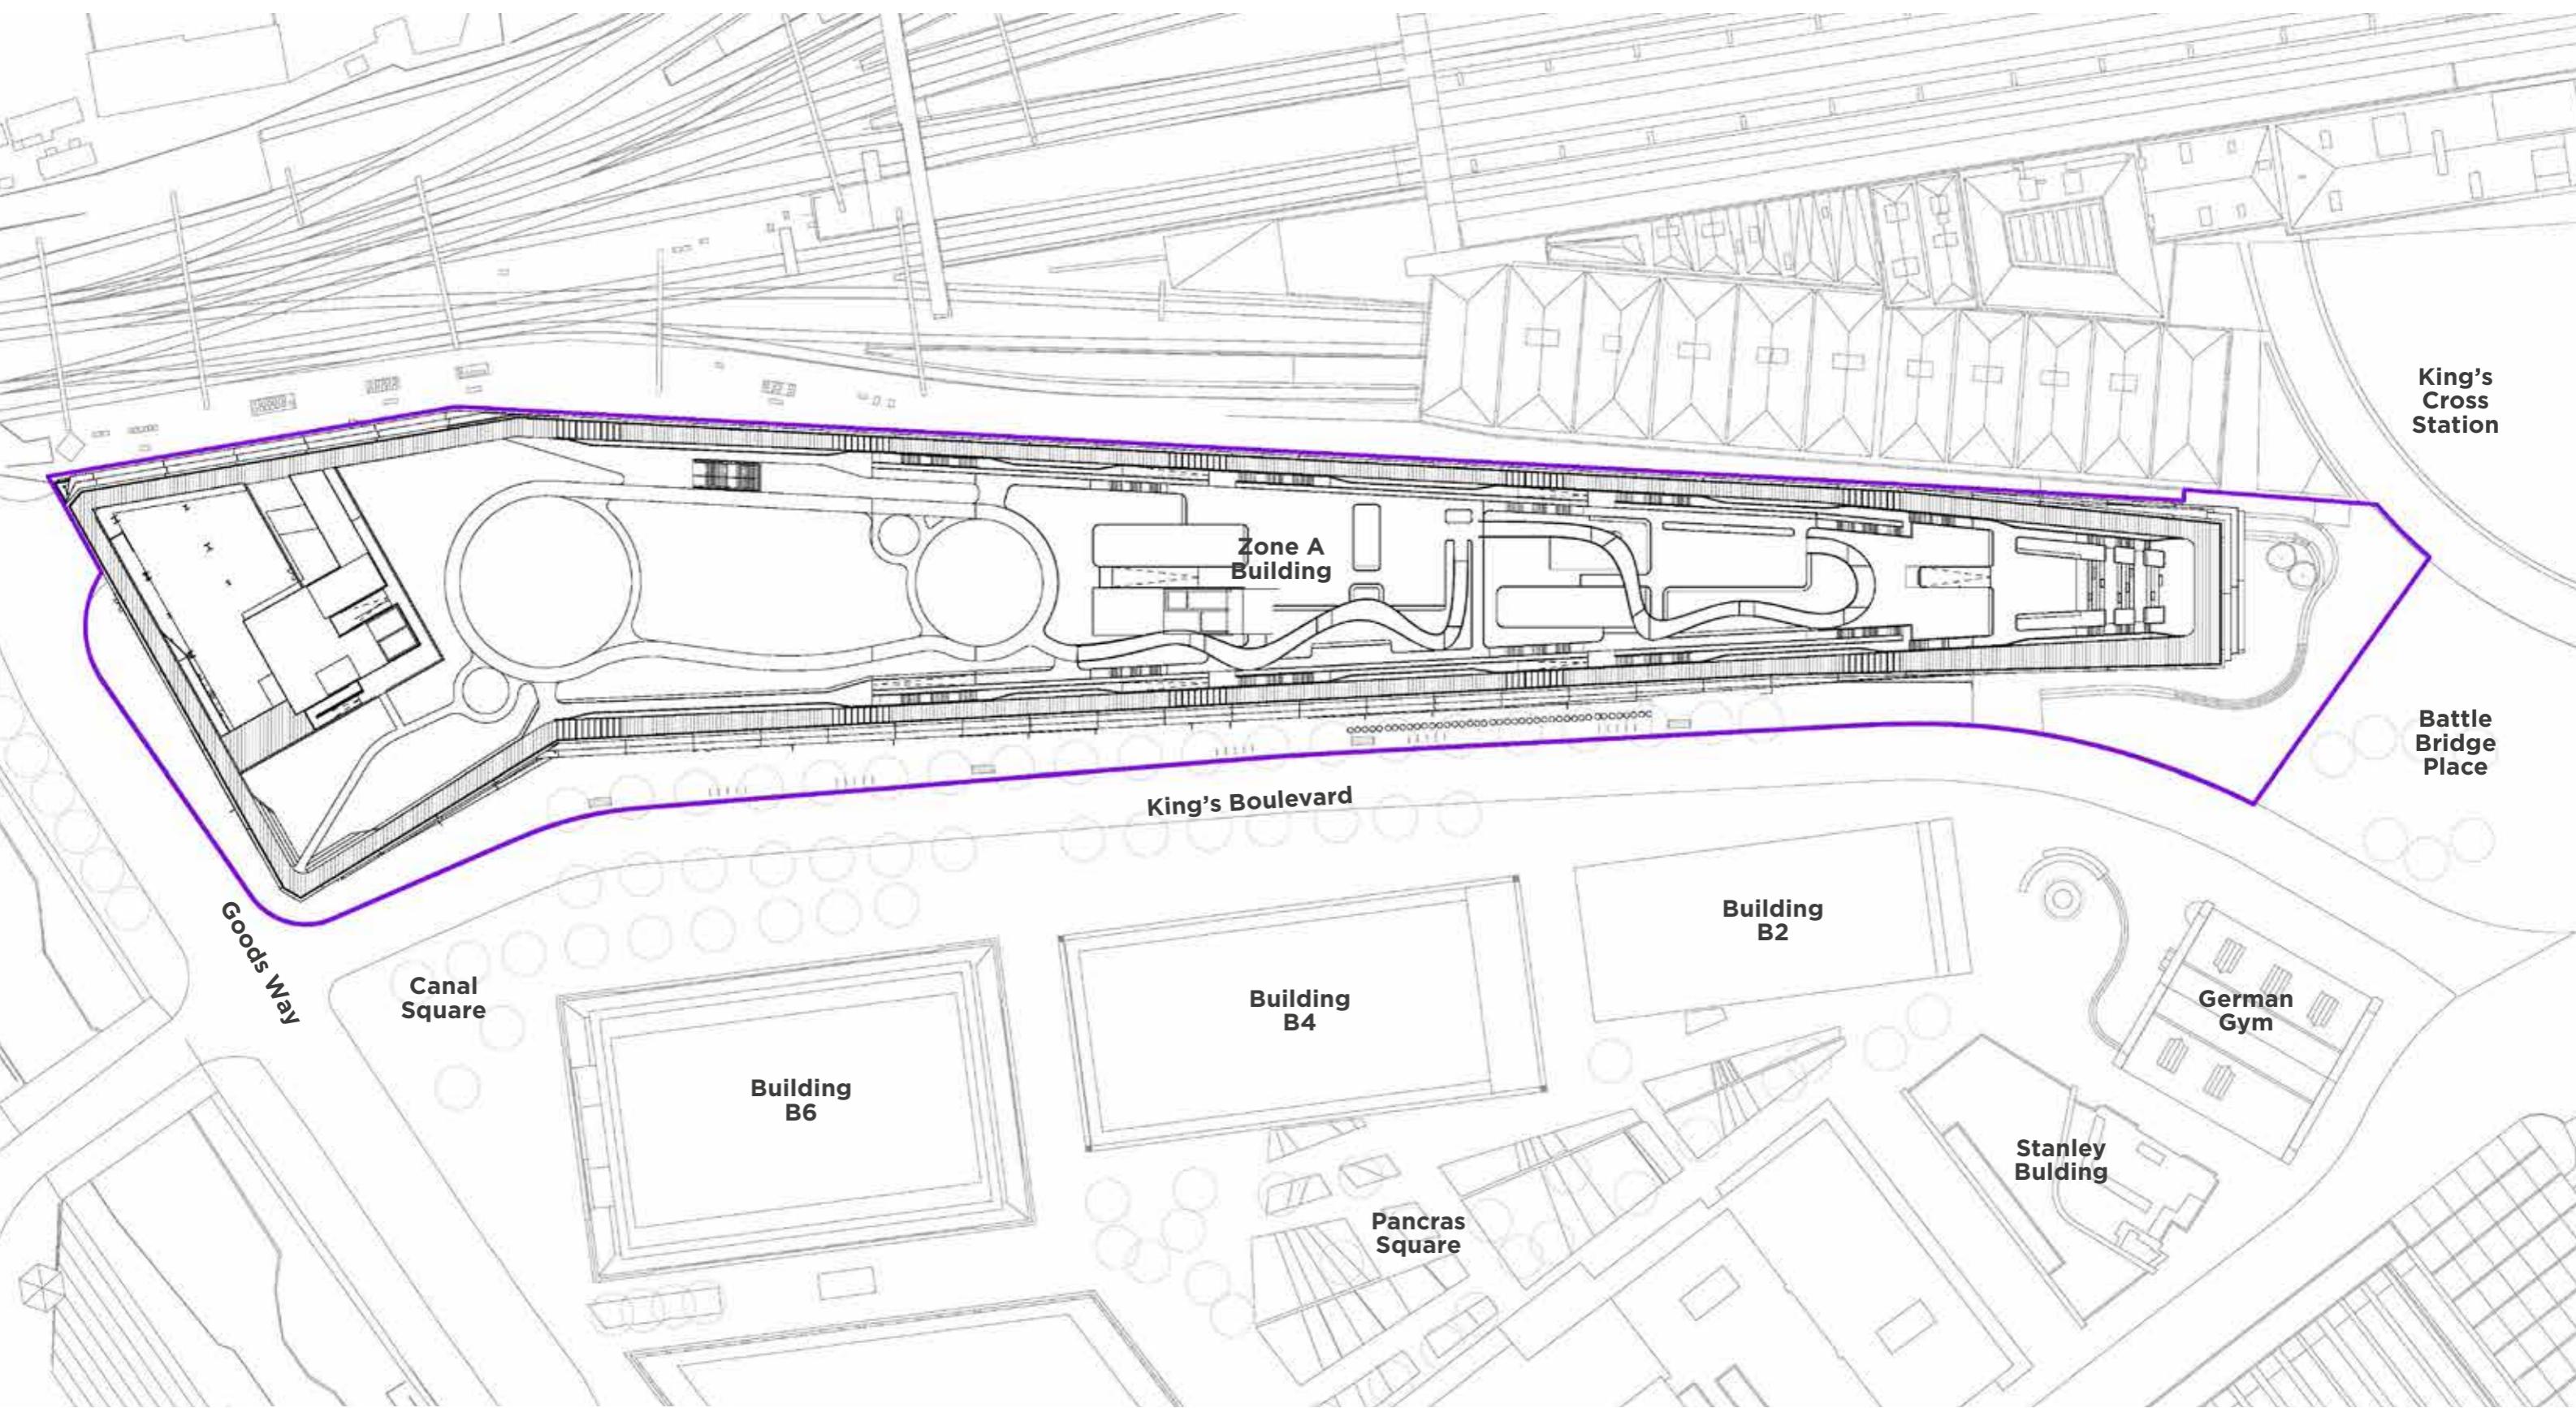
Site location plan showing the Zone A Building and the Reserved Matters submission boundary (edged in purple)
